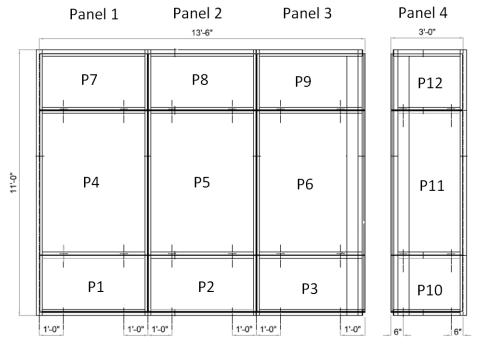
Elevation view of three panels and a perpendicular panel of a 4SSG curtain wall system (recreated from drawing provided by Bagatelos Architectural Glass Systems Inc.)
